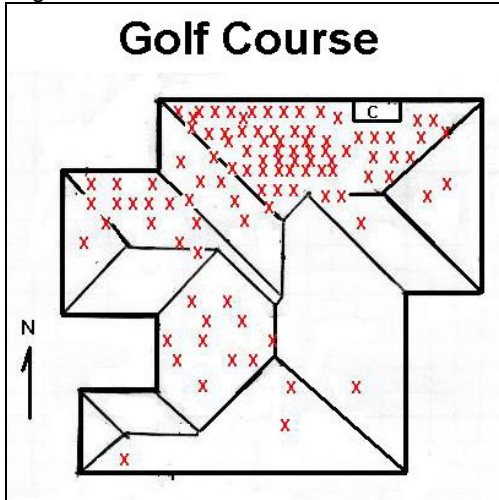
Case where errant golf balls damaged the roof tiles as noted by Xs.
